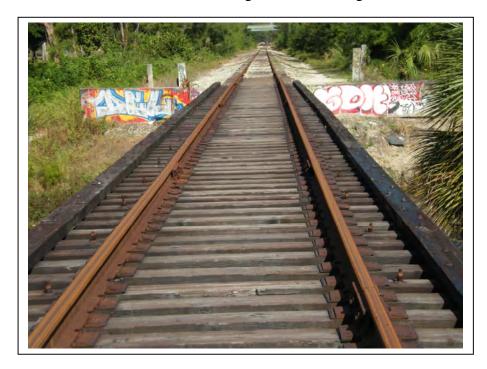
December 5, 2008 Intersection Flagler Street looking North
